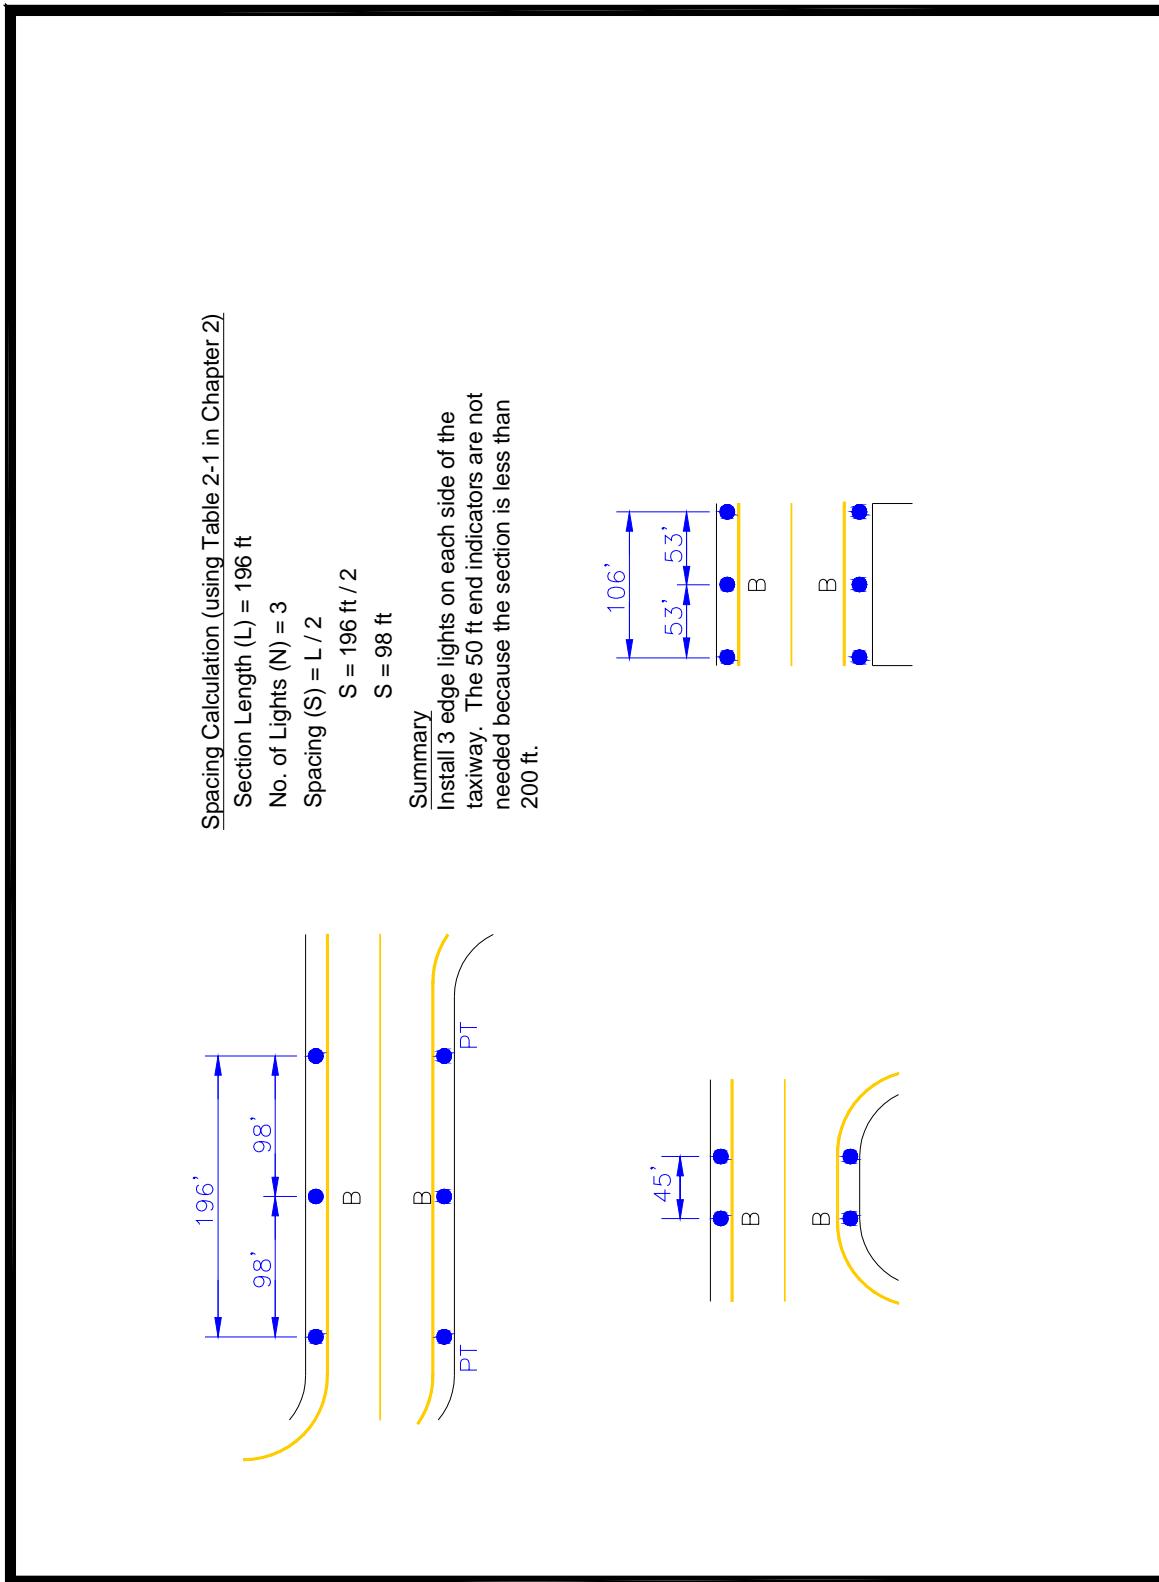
Typical Straight Taxiway Sections (Less Than 200 Feet).
